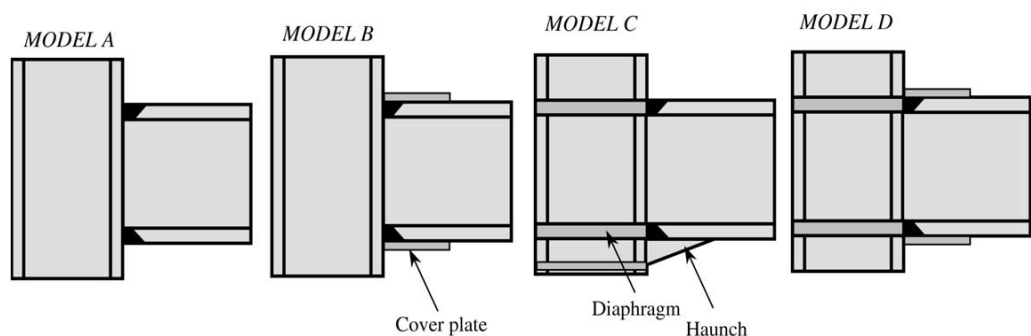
Beam-to-column connection details [Kiral and Erim , 2005]
